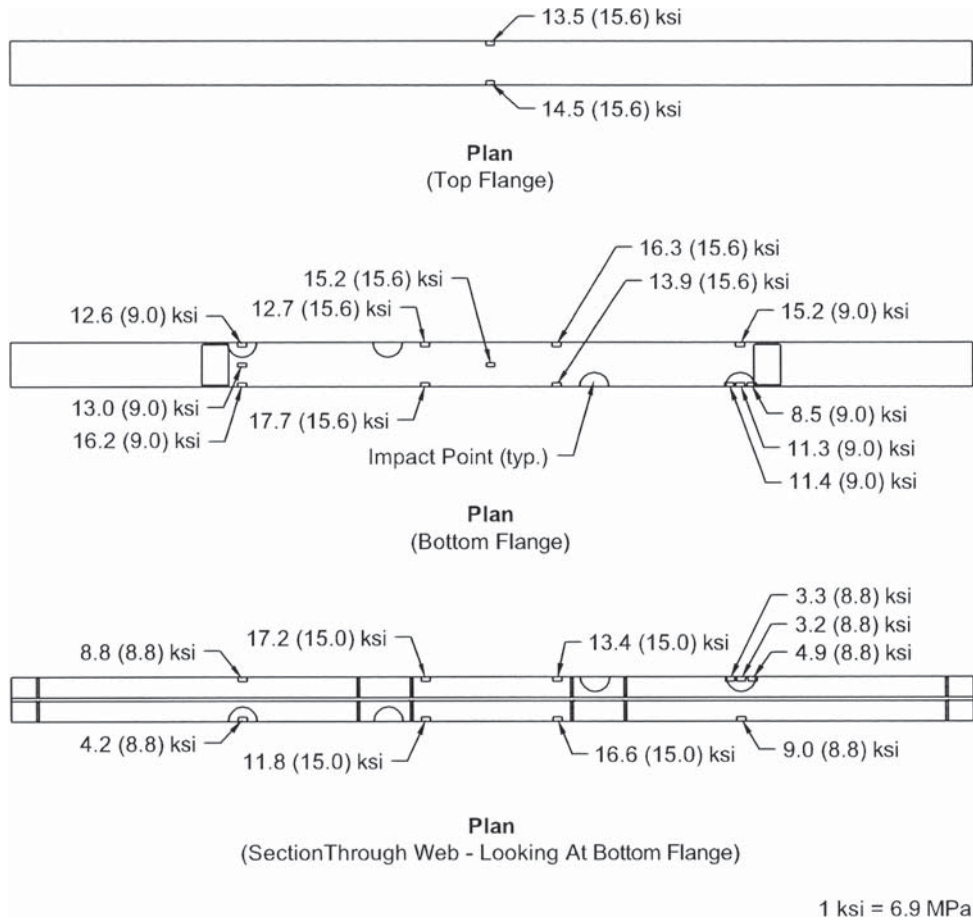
Stresses at detail locations under static load, Specimen 1D/R-2.
